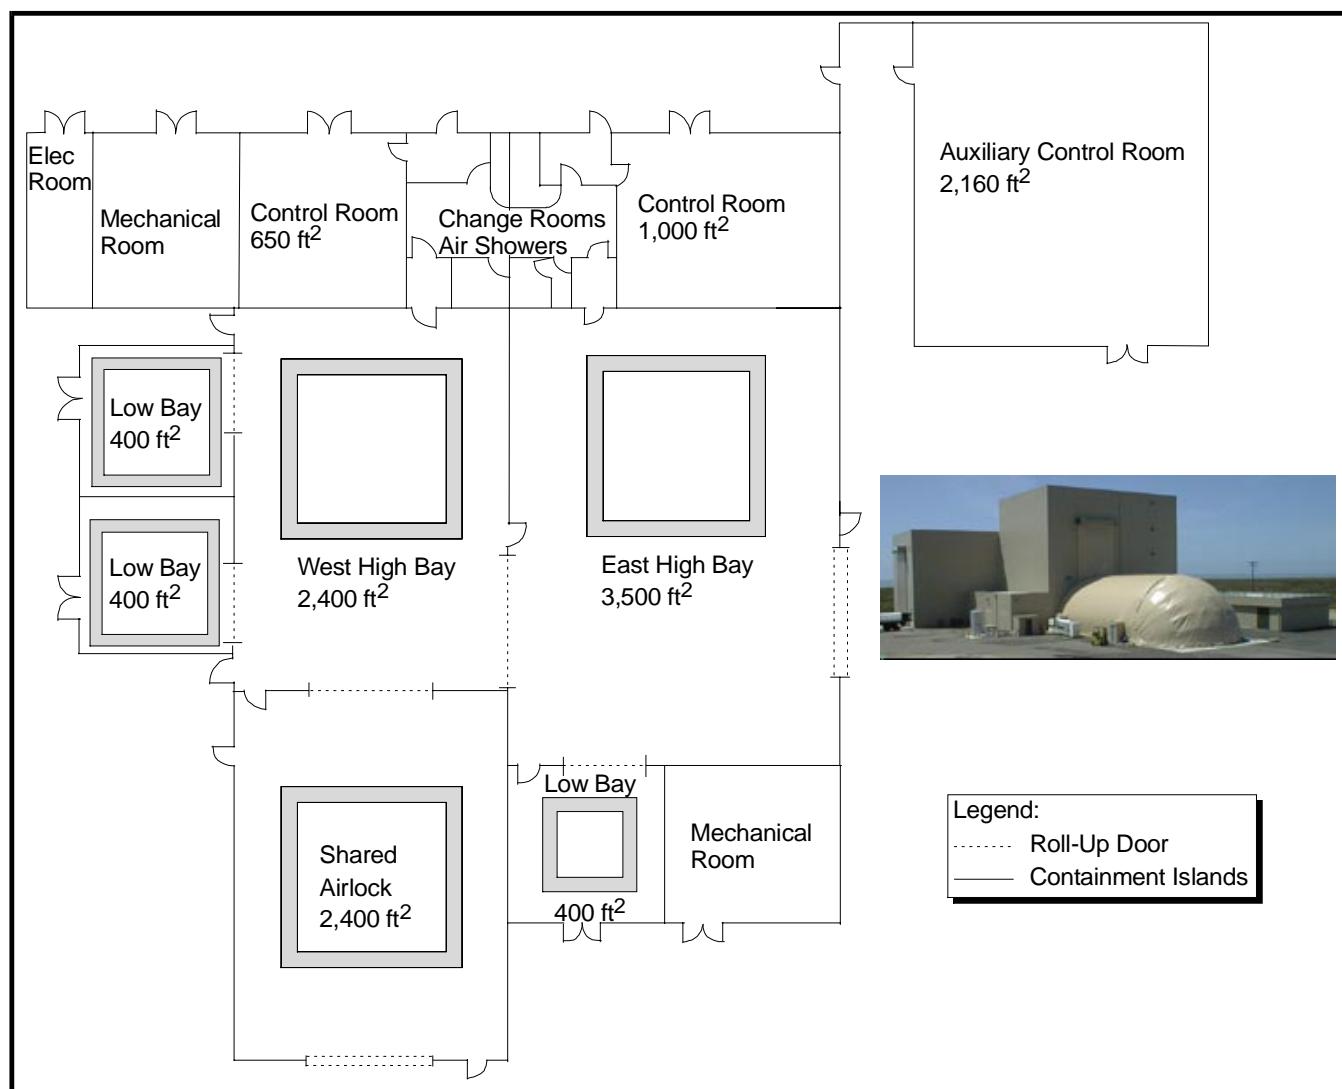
Astrotech/VAFB Payload Processing Facility Layout
